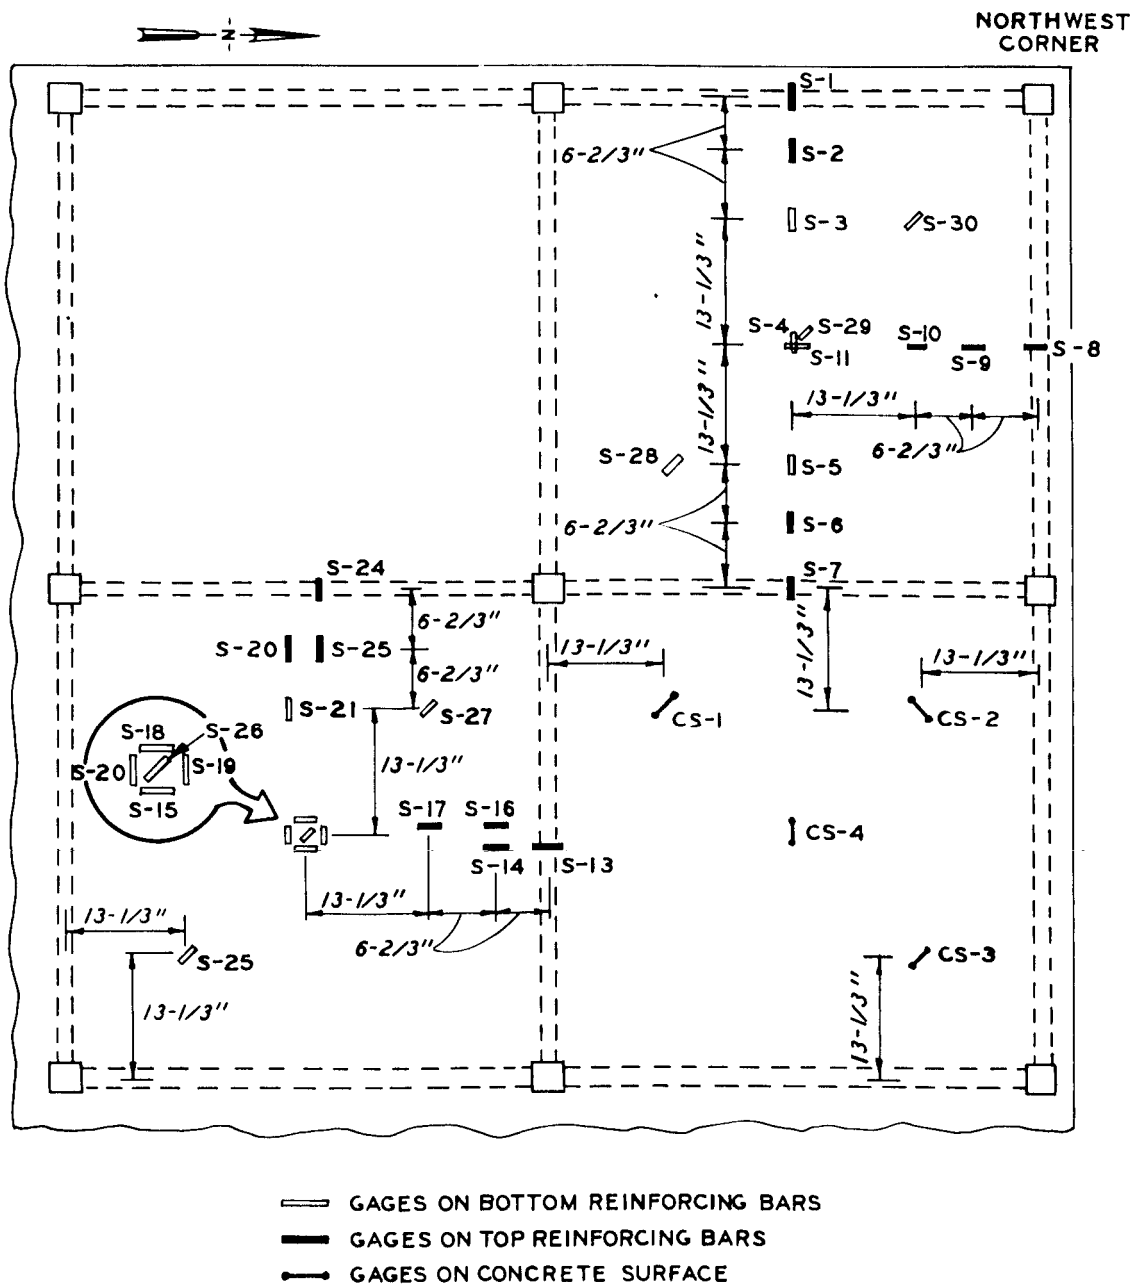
Locations of strain gages on reinforcing steel and concrete slab.
